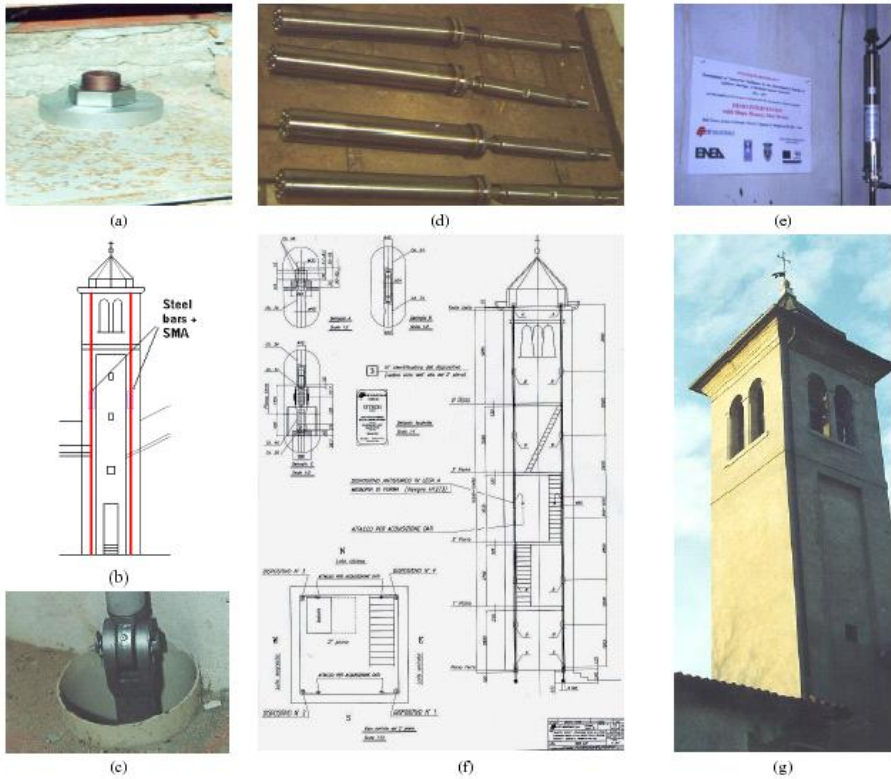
Application of 4 post-tensioned steel tie bars including SMADs: intervention scheme (b); anchorages at the building top (a) and at the foundation (c); SMADs before (d) and after (e) assembling; intervention details (f); Bell-Tower after restoring (g).
